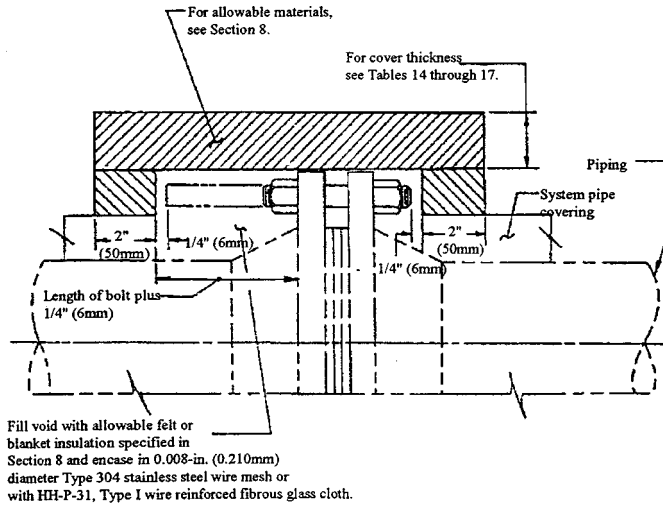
Typical Removable Flange Cover in Which Flange Diameter is Larger Than the Outside Diameter of the Adjacent Pipe Covering
